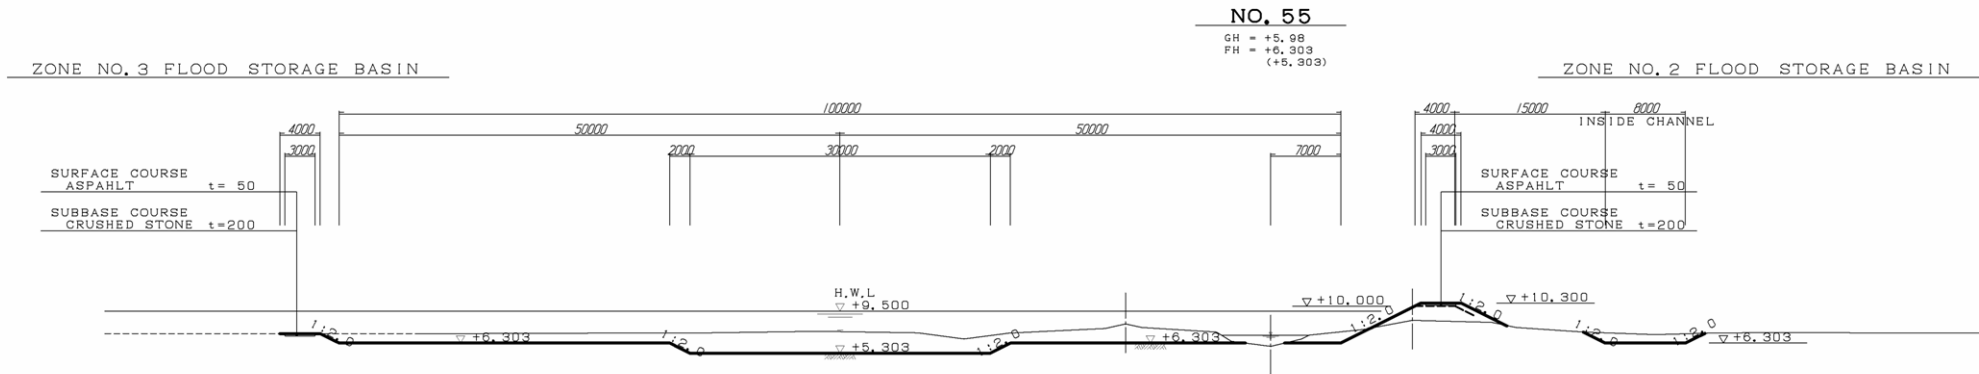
Typical Cross Section of Section (1) to (6) Inflow Channel
